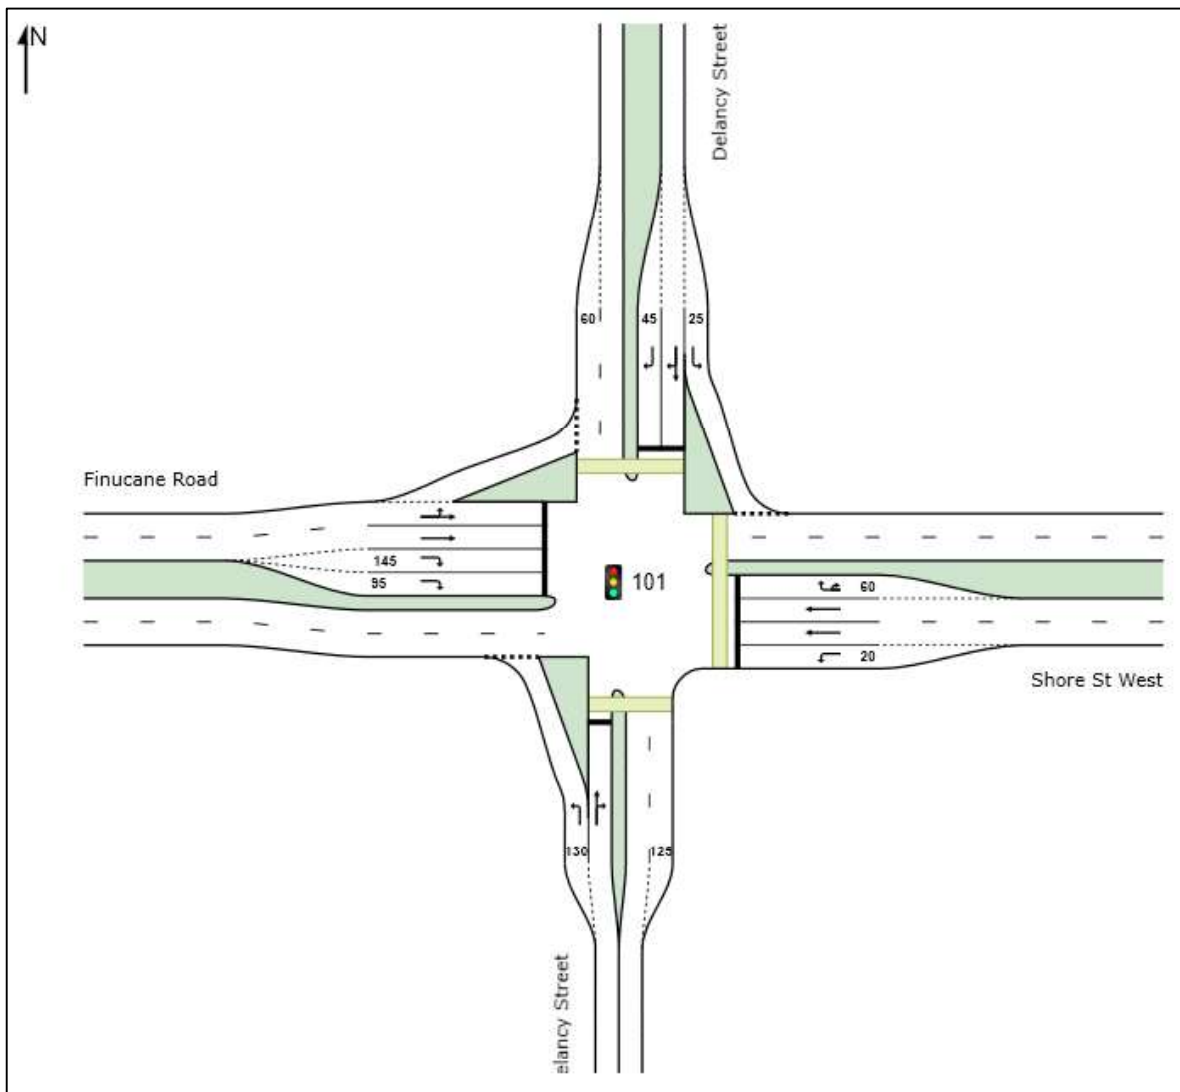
Finucane Road / Delancey Street Intersection Upgraded – SIDRA Layout
